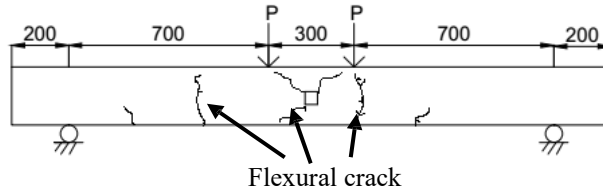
Crack pattern of beam B2 (unit in mm).
